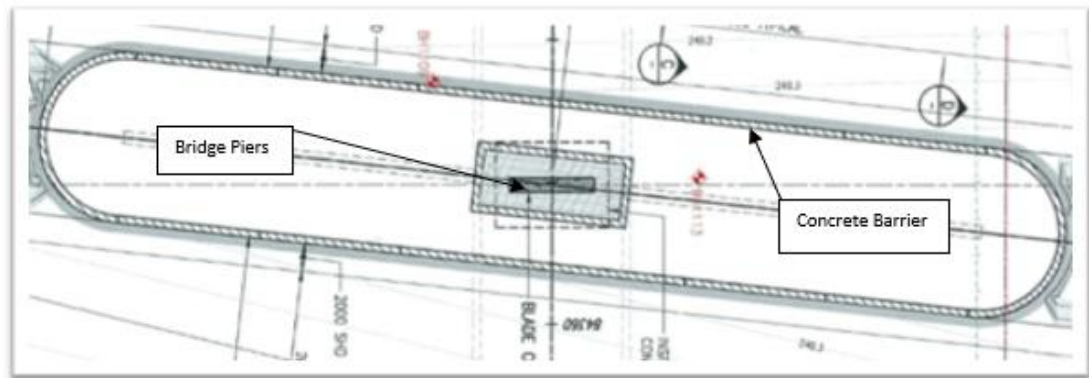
Example plan of concrete structure as haul vehicle control measure
